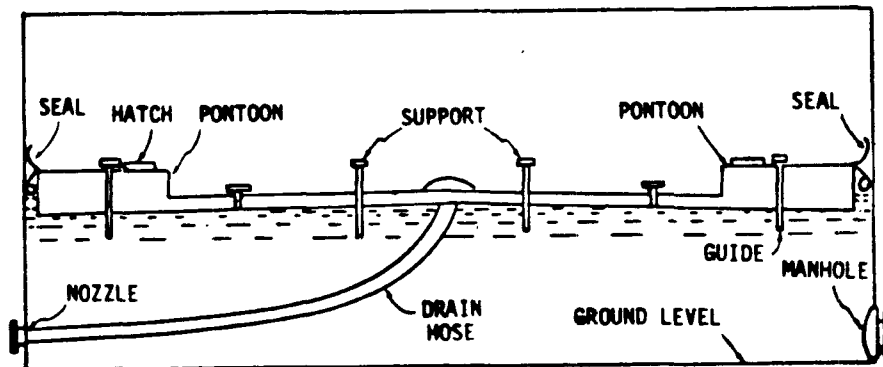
Single deck, external floating-roof storage tank.<sup>2</sup>
